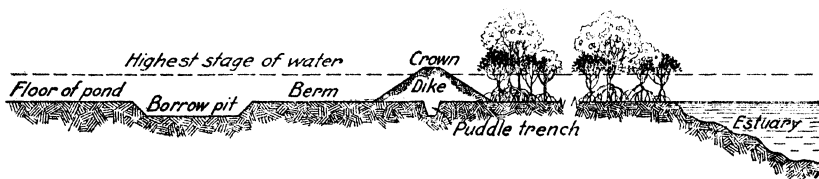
Cross section of main dike showing puddle trench, berm, borrow pit, and floor of pond.
